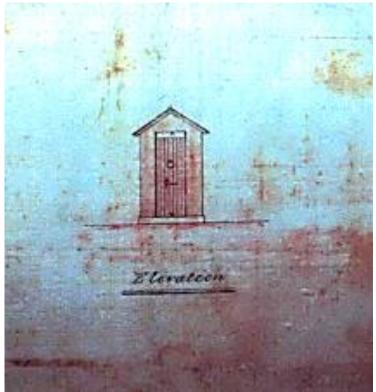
Orange Courthouse Barnet design 1881/3– detail Closet elevation. Source: Source: AONSW Plan 834 in Mider, 1998
